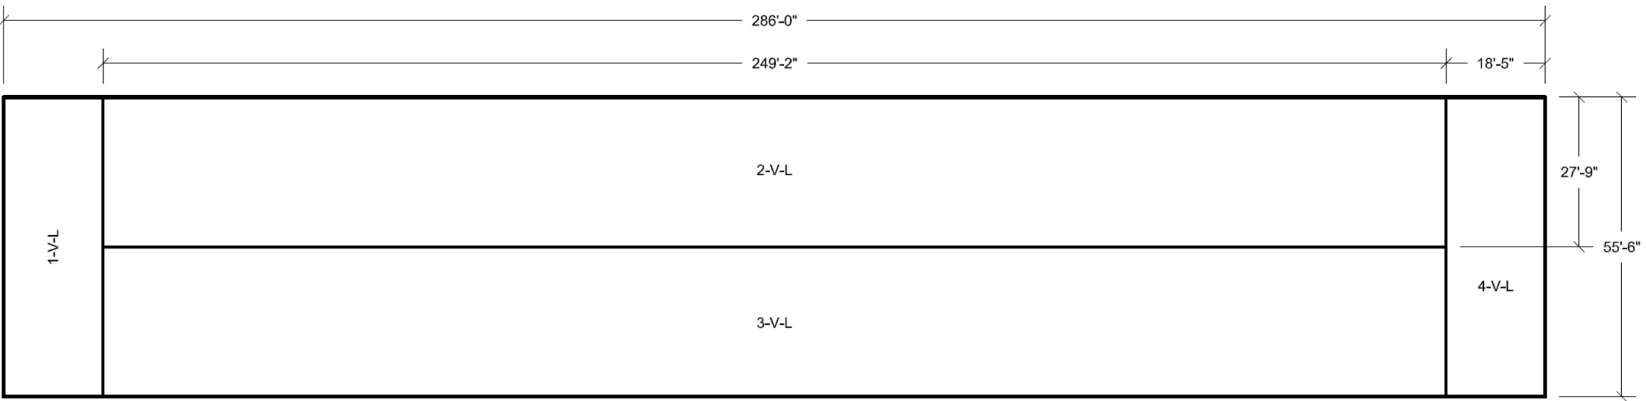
H.6-109 Cooling Tower North (and South) Wall Looking South (North)
